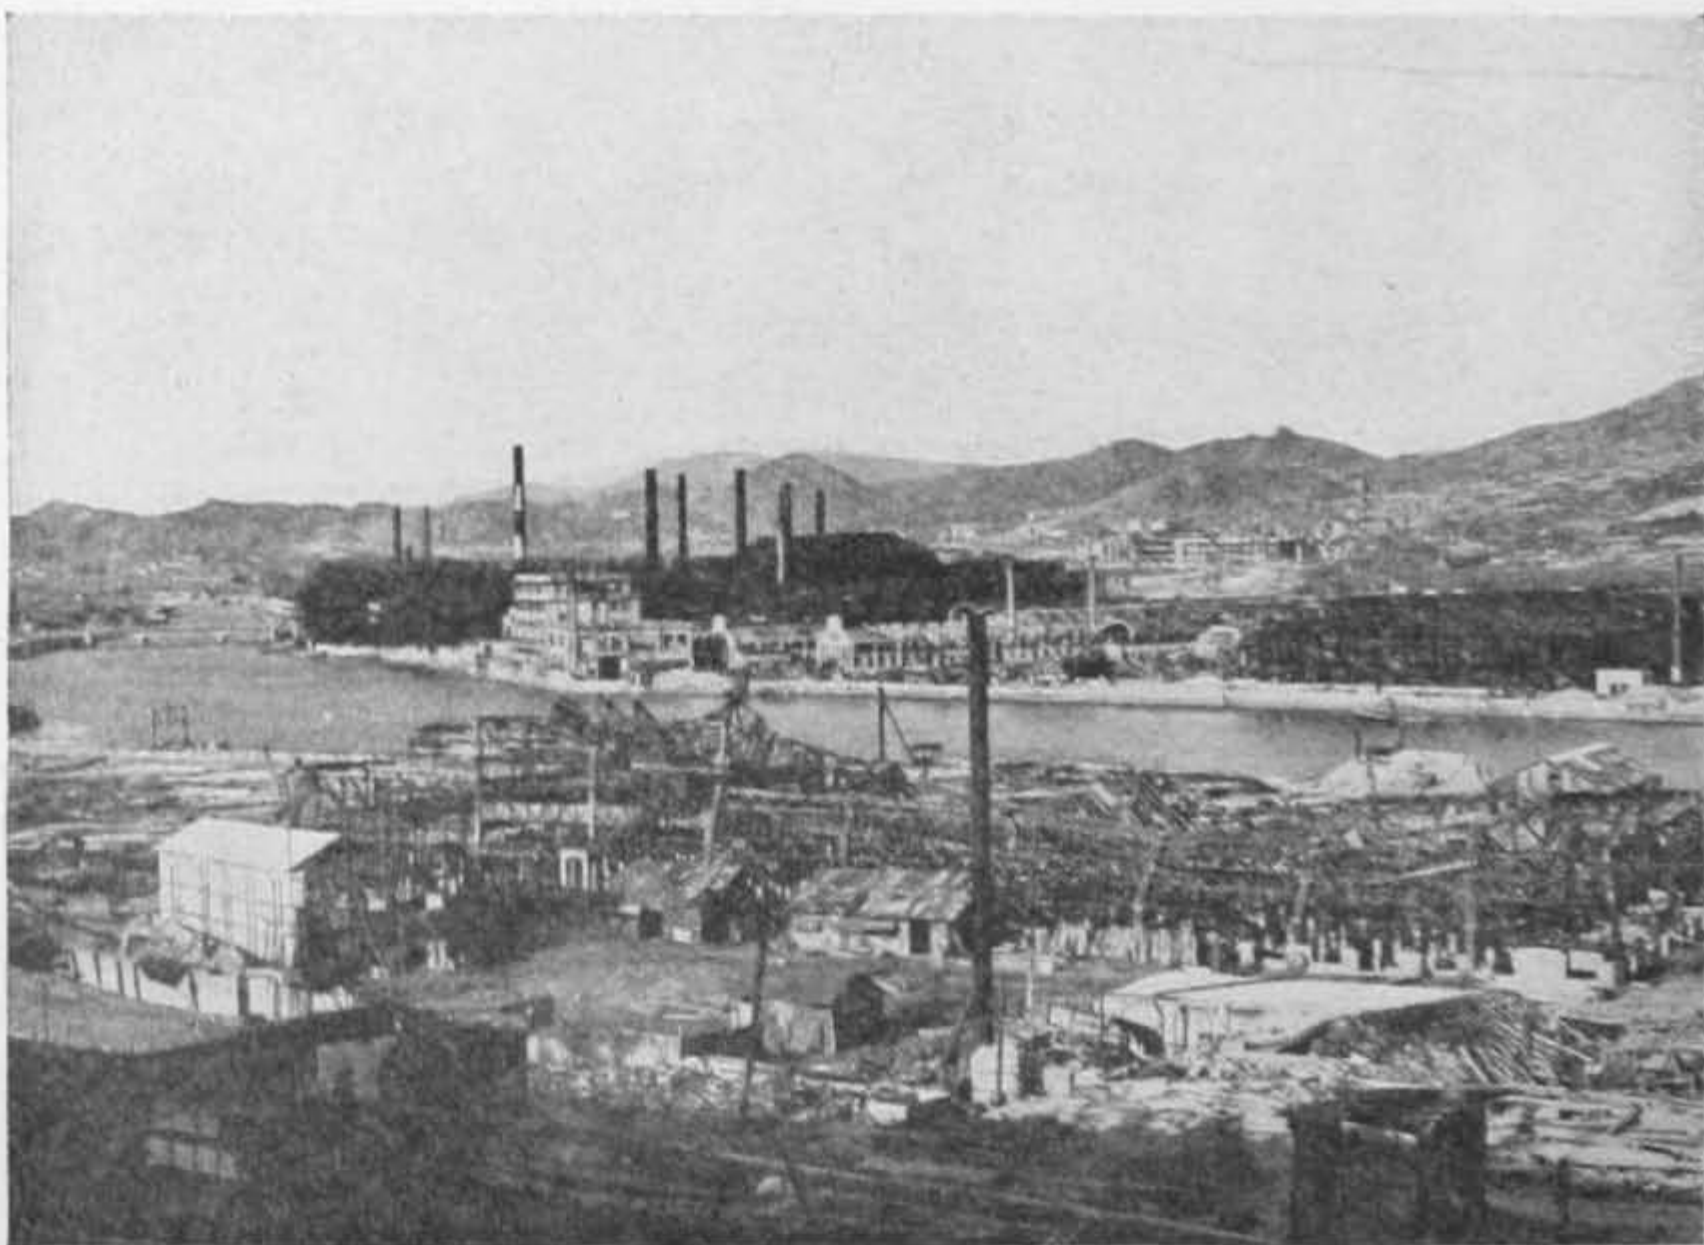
N A G A S A K I . A general view showing some of the industrial buildings. That in the foreground was a gutted woodworking plant, just over a mile from the centre of damage, which was beyond the group of chimneys of the Mitsubishi Steel Works, seen in the middle distance.
